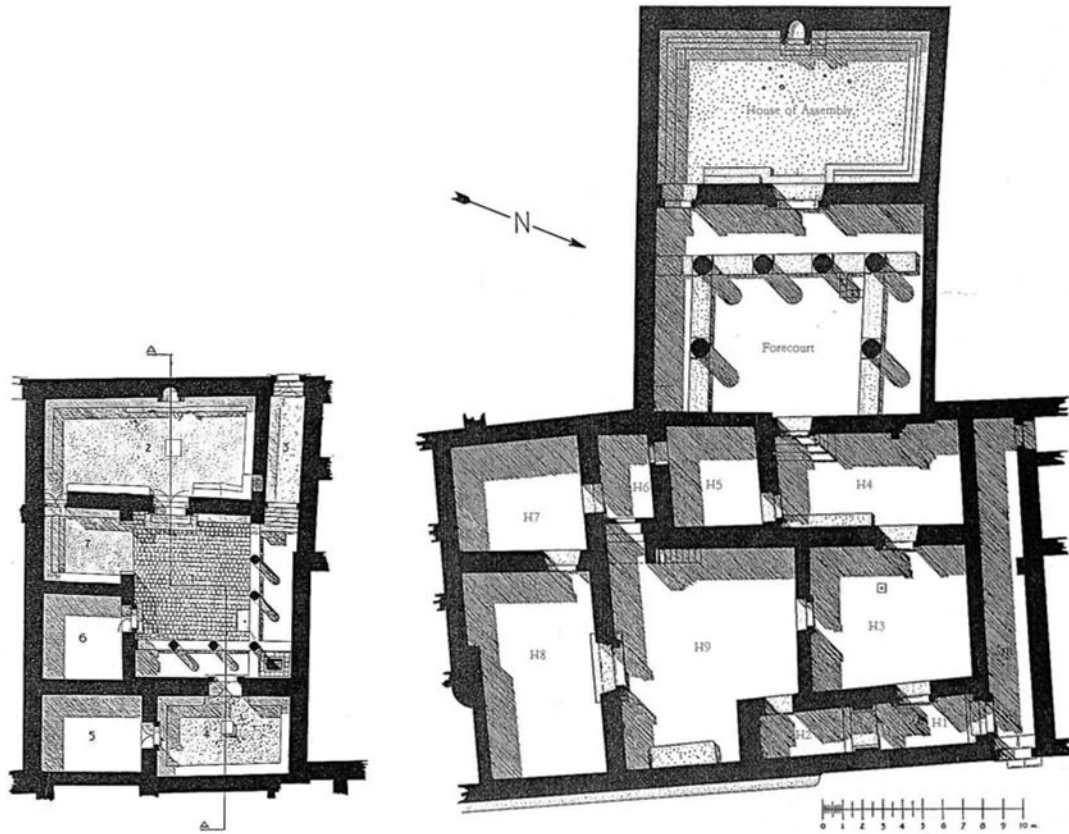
Plan of Dura: (left) earlier building; (right) second stage.
